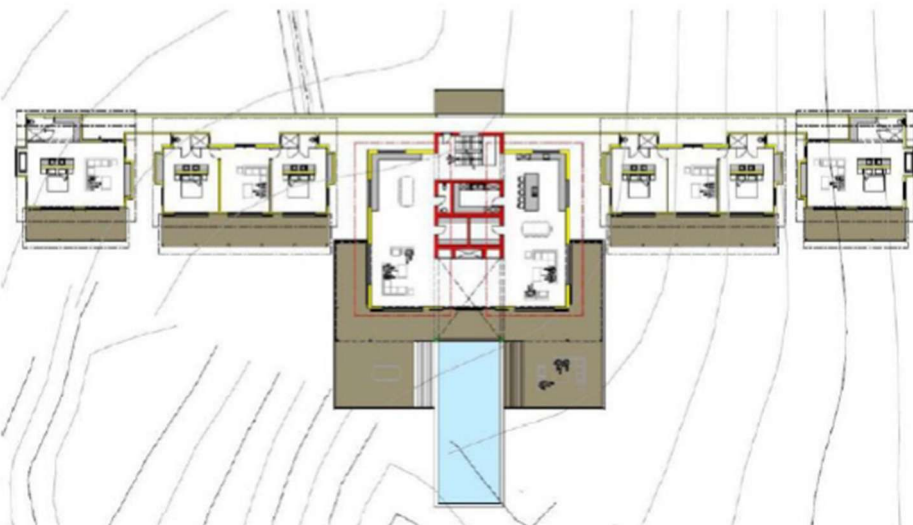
PROPOSED MAIN DWELLING HOUSE
